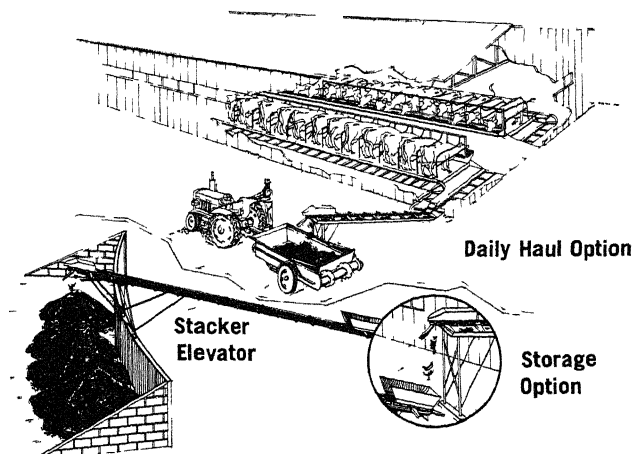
Confinement dairy barn with conventional gutter cleaner or elevator (stacker) and concrete pad storage.
